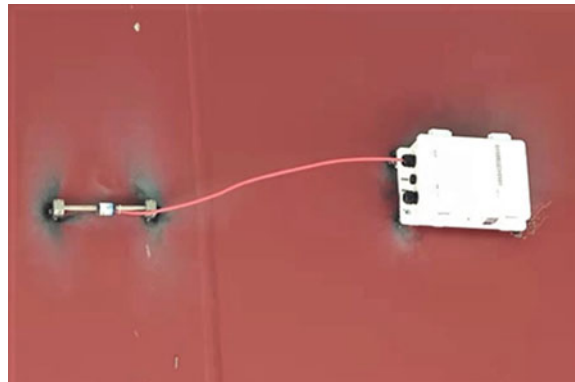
Layout of stress monitoring points of beam and arch sections
